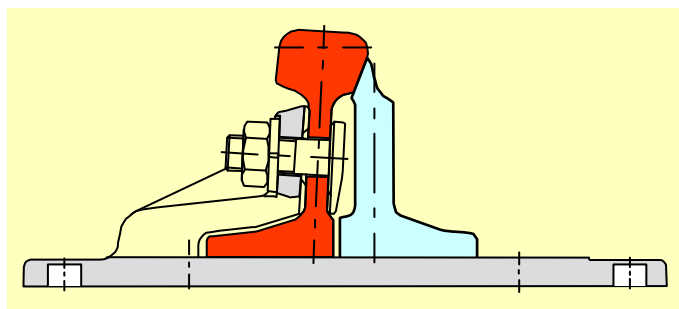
Cross-sectional drawing of T-rail switch blade
